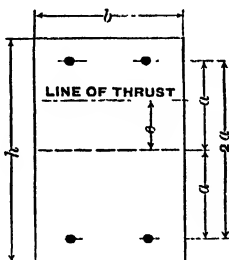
Cross Section of an Arch Rib. (See p. 564.)
